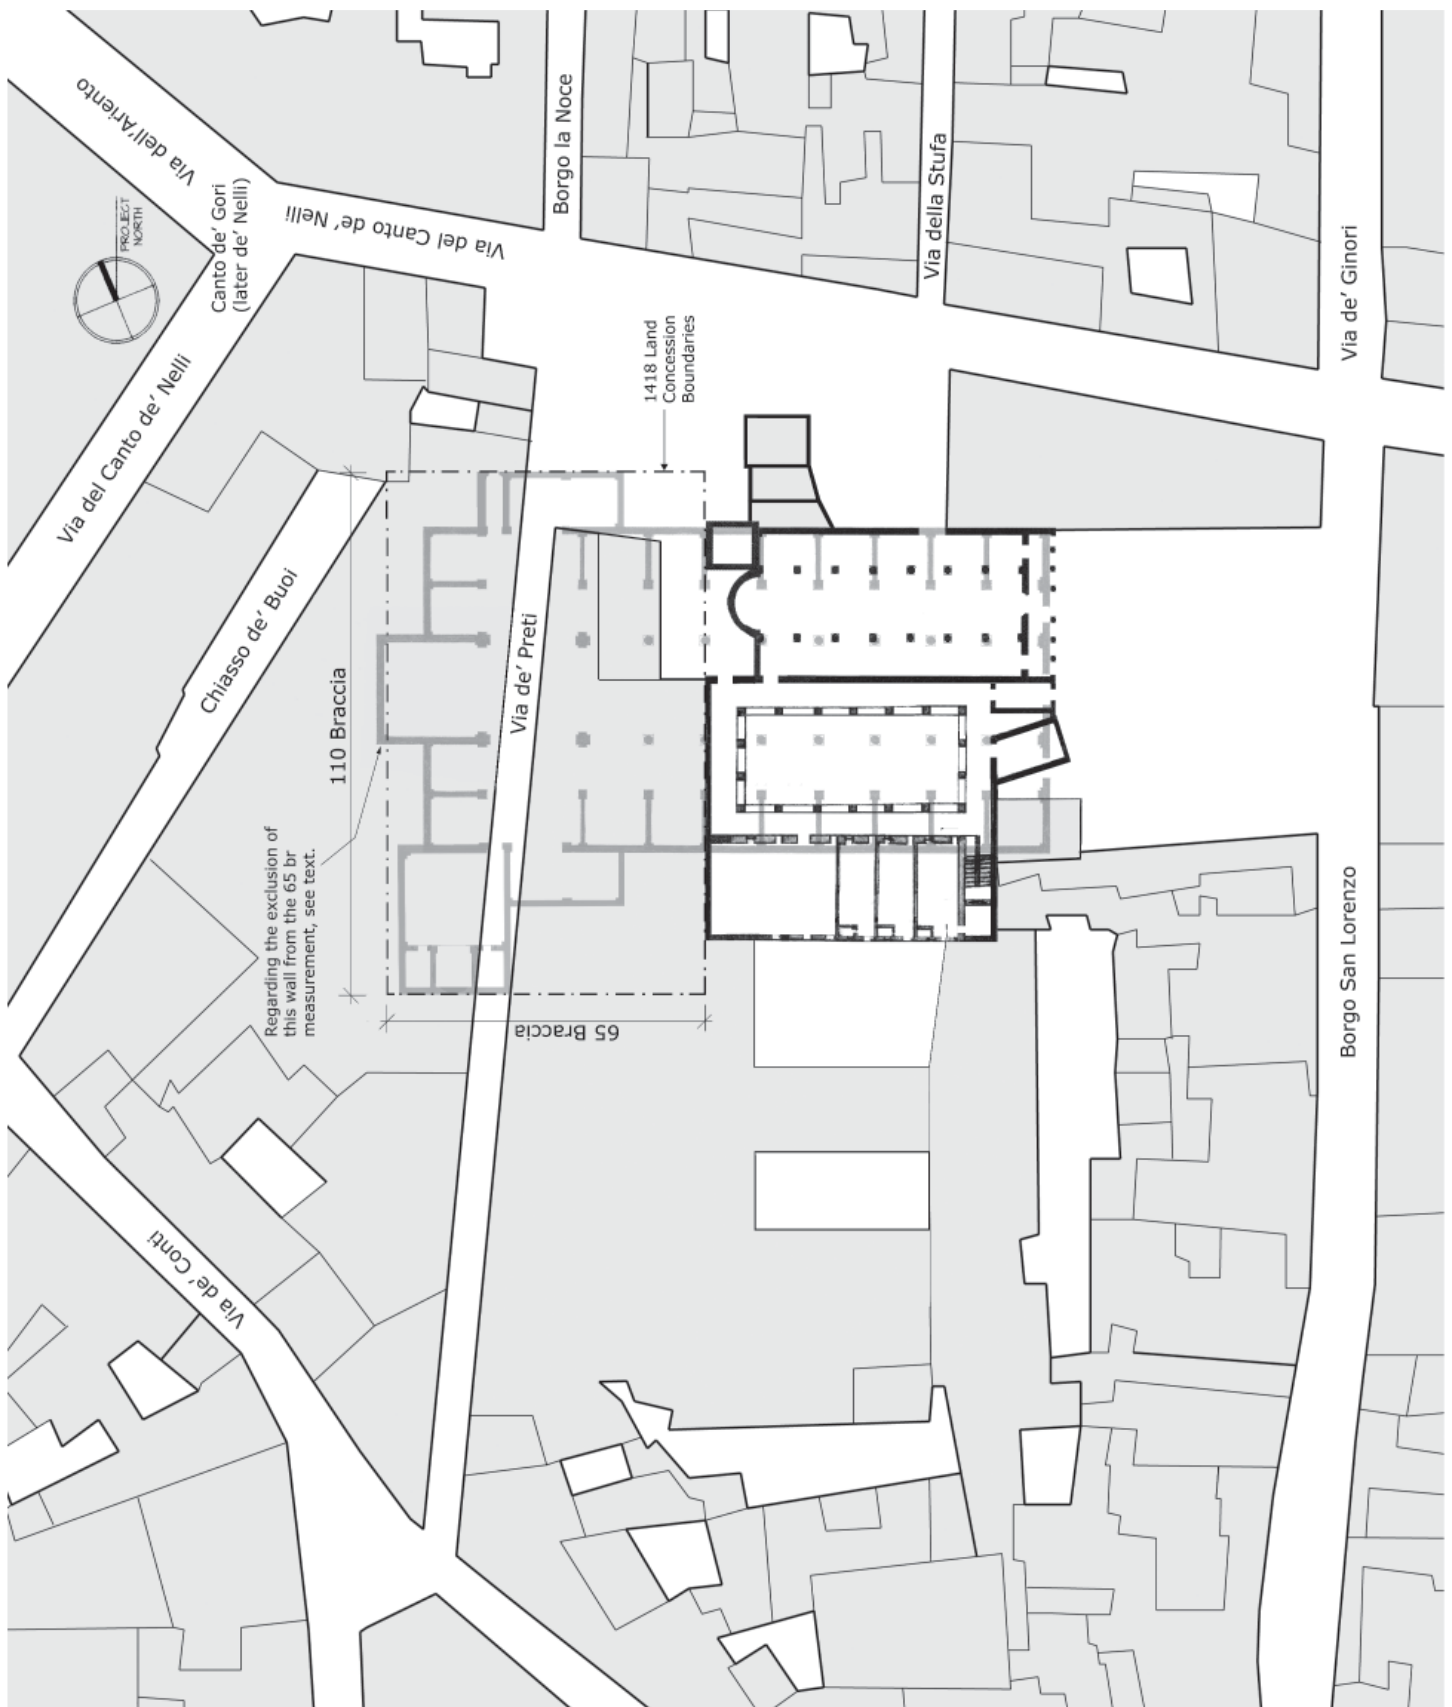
Basilica of San Lorenzo, 1418 site conditions, reconstruction.
